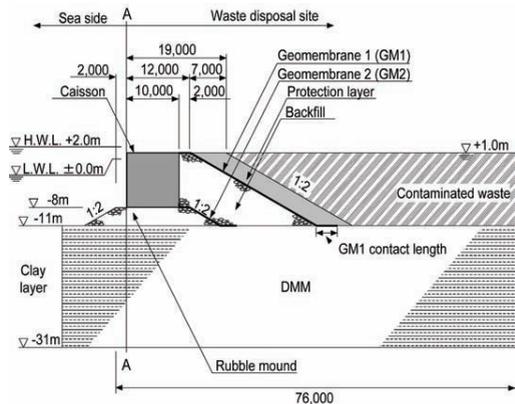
Cross Section of caisson quay wall barrier system for Kamon and Inui (2002) advection-dispersion modeling
